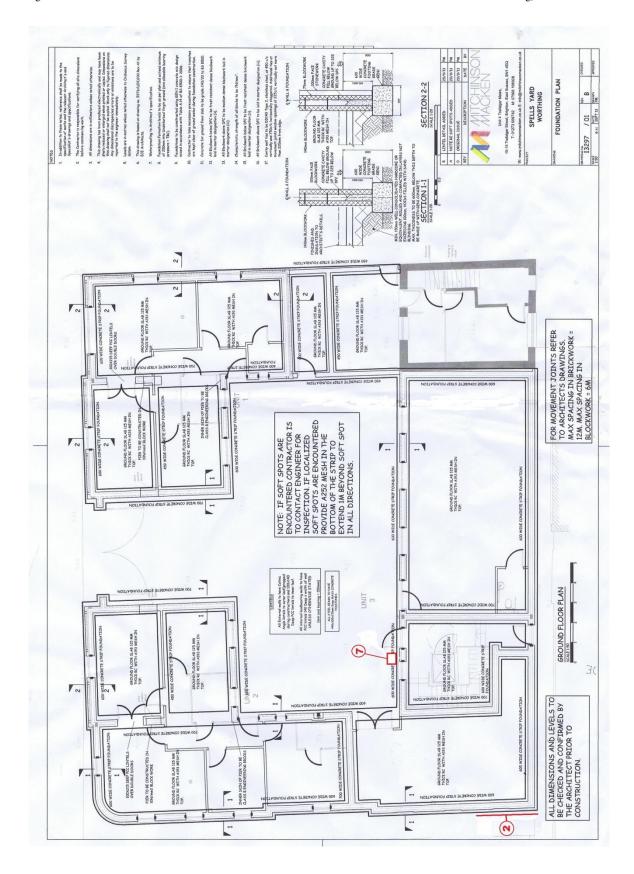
Spells Yard, Worthing: Foundation Plan showing locations of Contexts 2 and 7.
